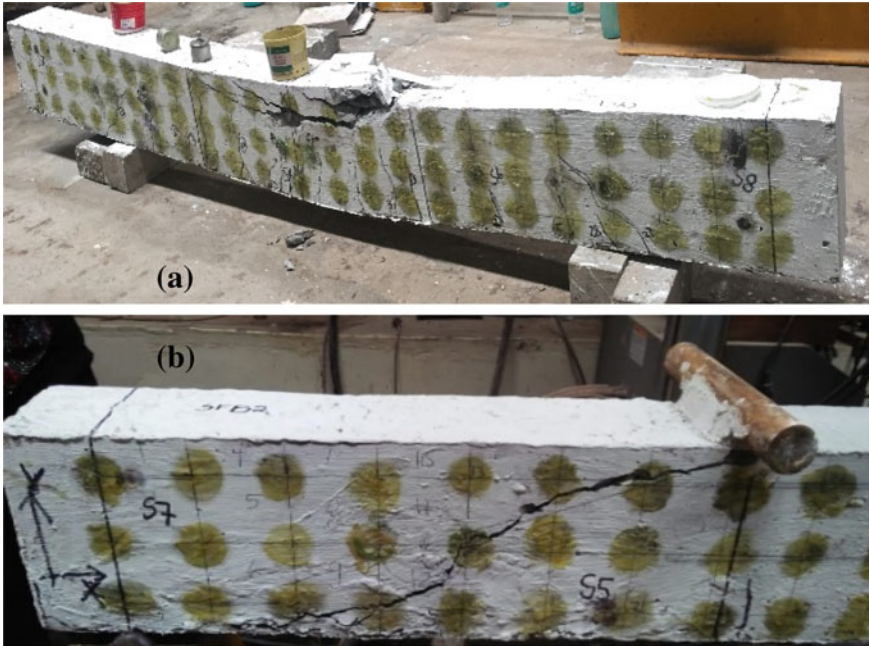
RC beams after the test. a Development tensile crack at mid-span in specimen ff1 b diagonal shear crack developed in specimen sf2
